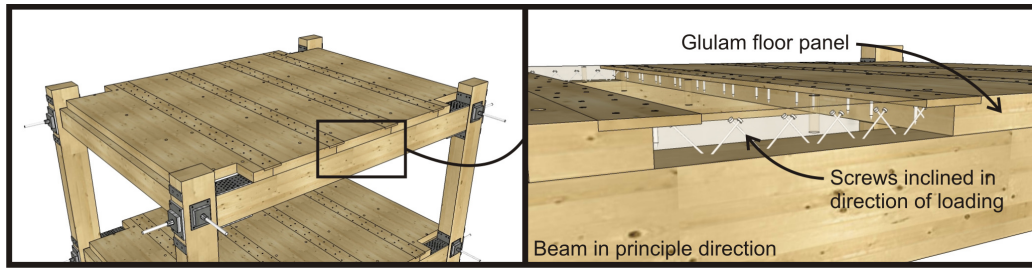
Timber flooring used in 2/3rd scale, 3-storey dynamic test frame
